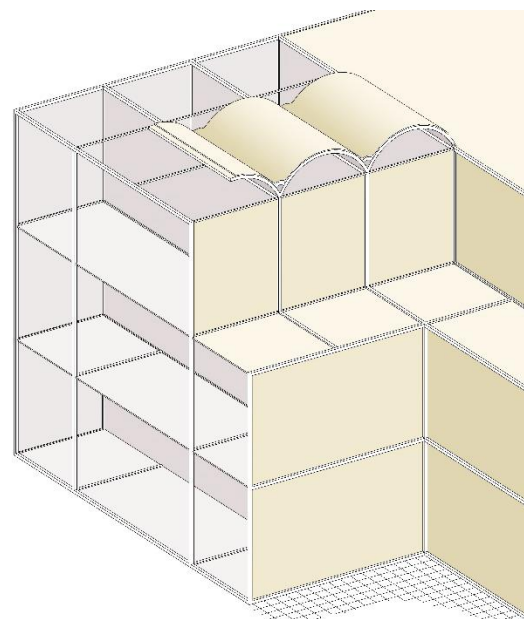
, recommendation of application of light steel frame in buildings for post and beam system, drawing by author
